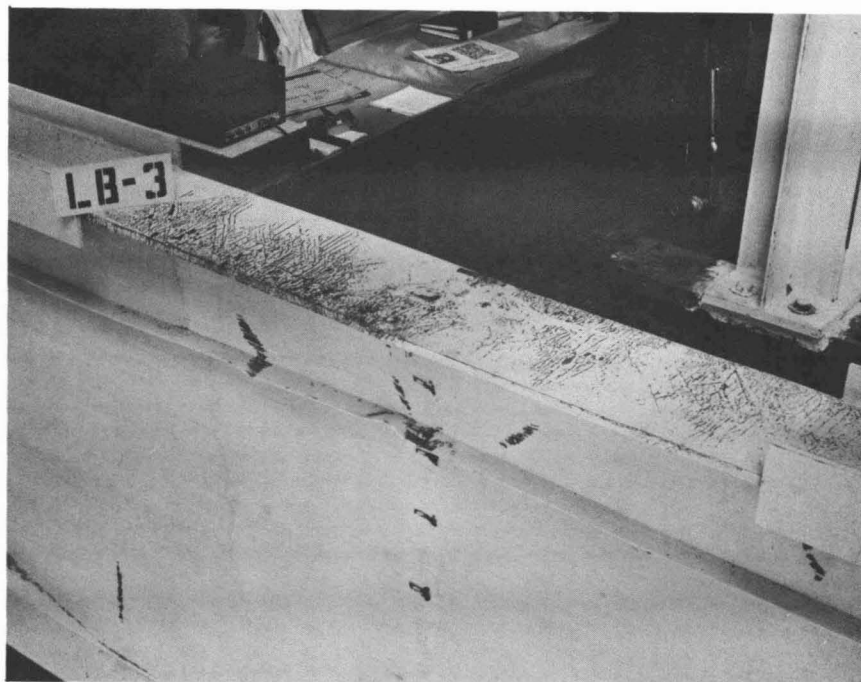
Compression Flange Yield Pattern (Specimen LB3)
